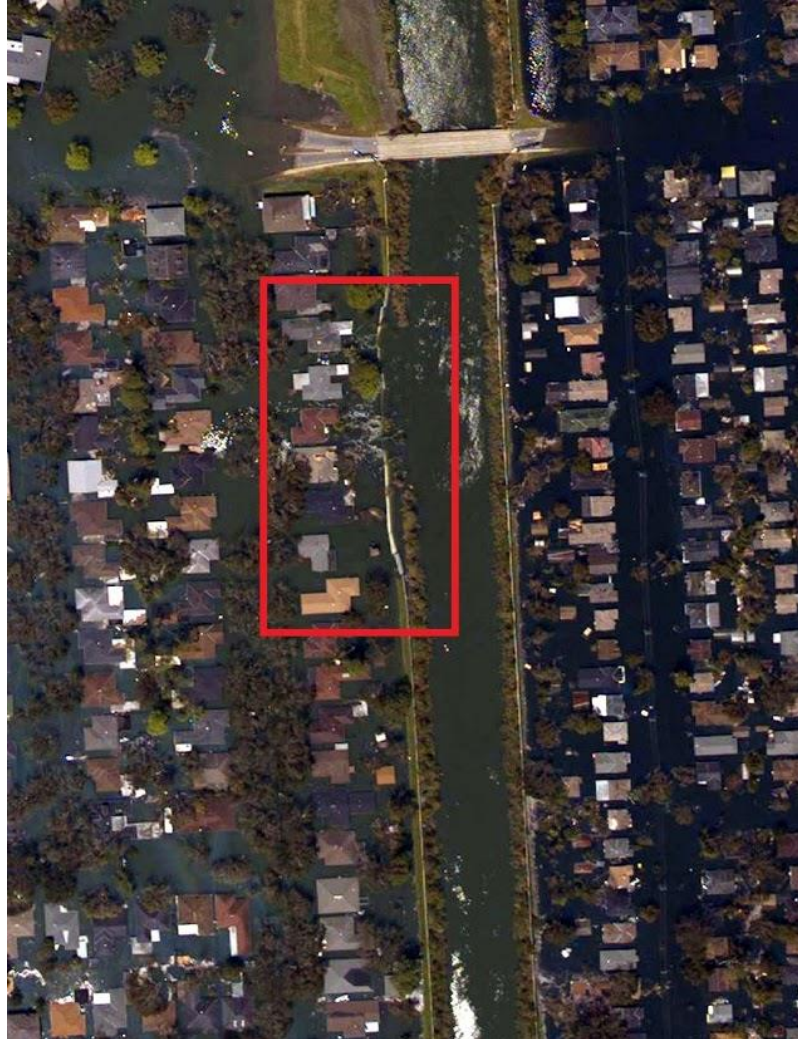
The London Street Avenue Canal collapsed, flooding the Gentilly residences with stormwater from Lake Ponchartrain. Source: NOAA, 2005
